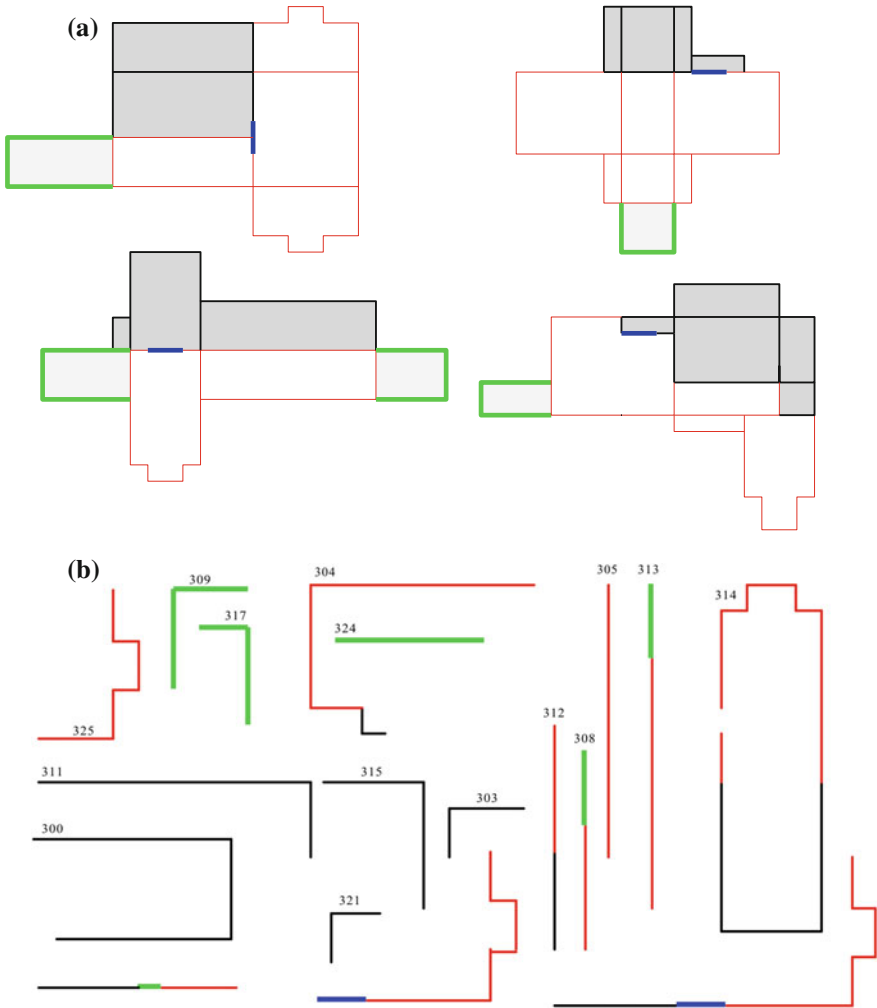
a Four Frank Lloyd Wright prairie house floor plans, b 18 genes that represent the cultural DNA embodied in those floor plans (after [10])
